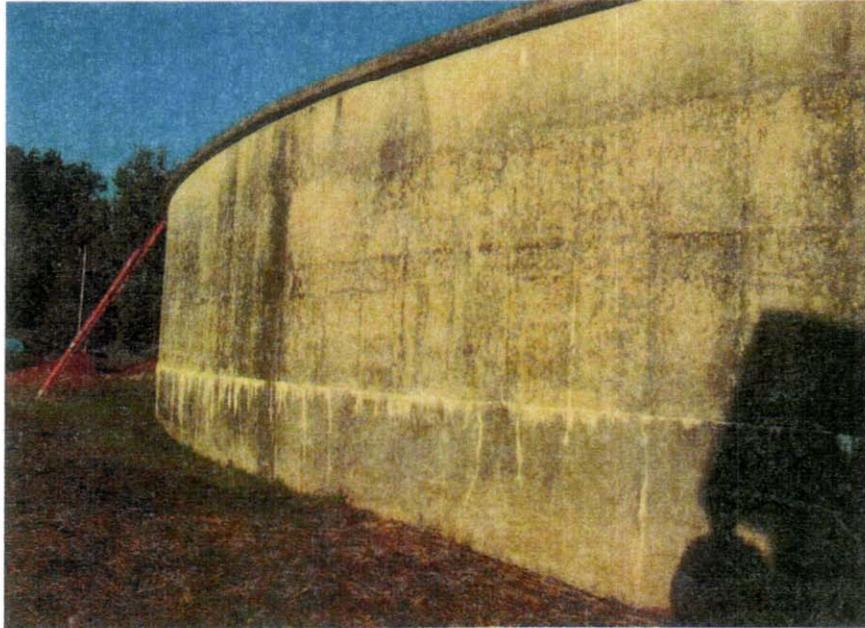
Exterior Clearwell Wall – Horizontal Construction Joint
